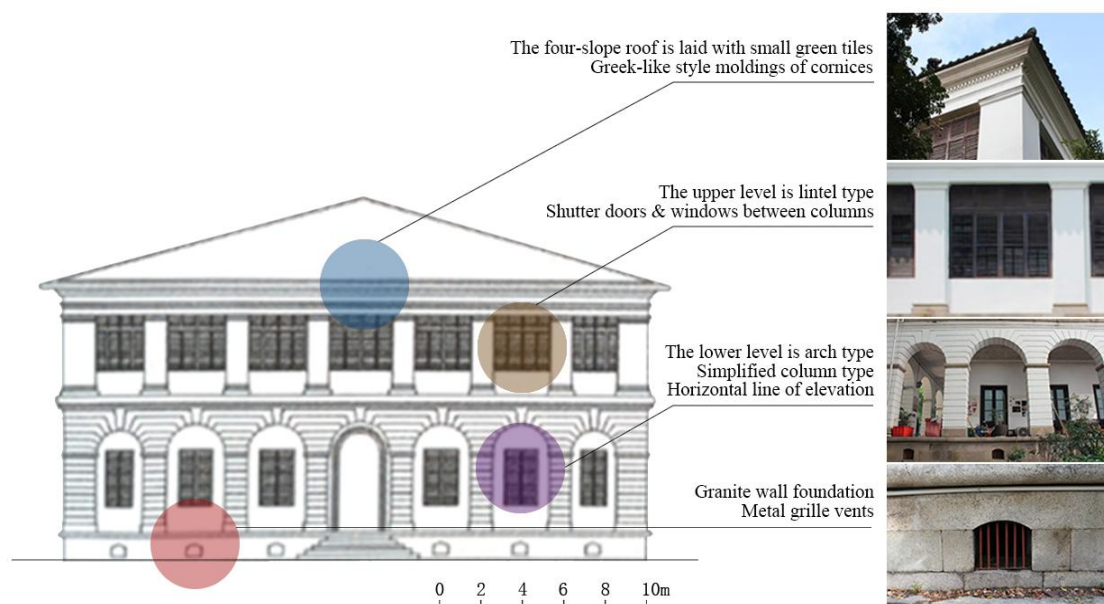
Typical facade elements of modern veranda architecture in Yantai Mountain, Fuzhou
